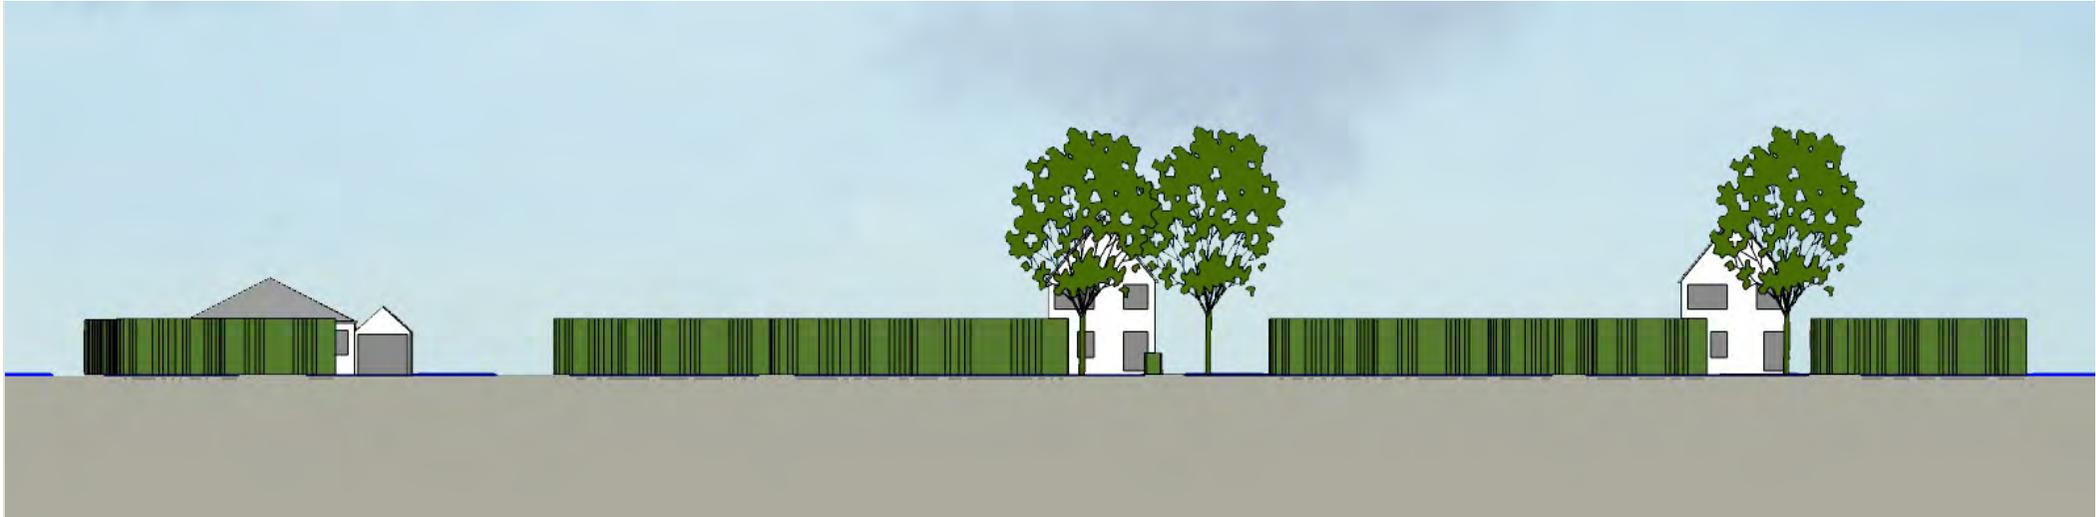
Section showing a typical existing street within the South Downs Fringe.
